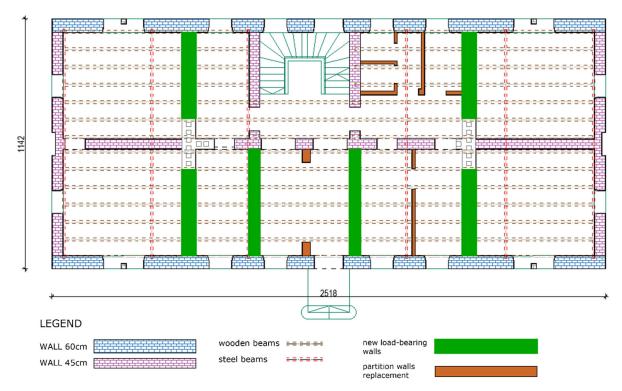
Proposal for the position of the new load-bearing walls and proposal for the removal and replacement of partition walls.
